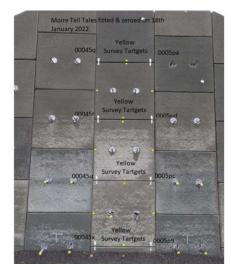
Location of Moiré tell-tales and survey target on front elevation of wall.
